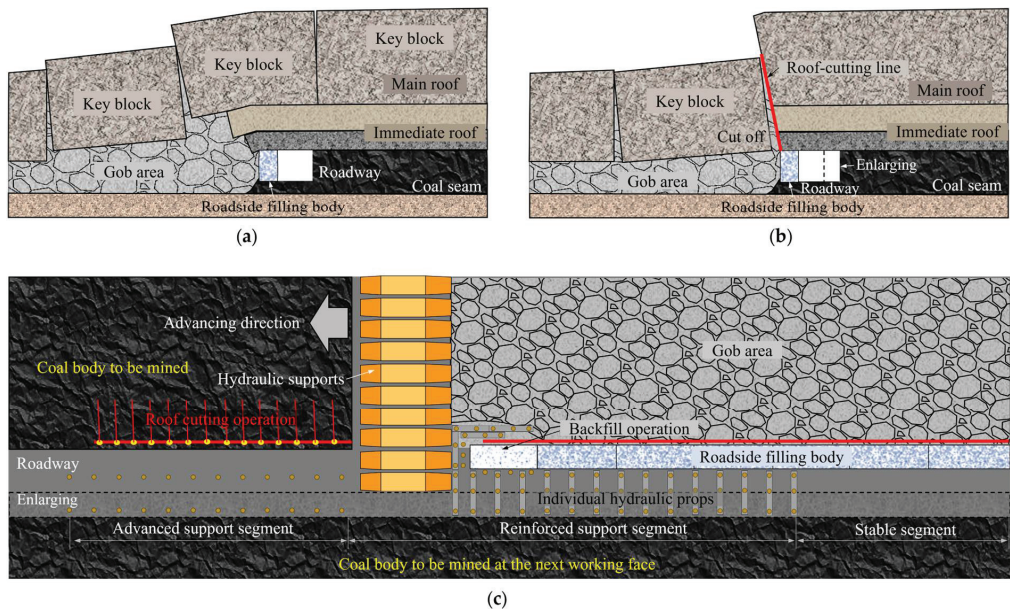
Delayed pre-splitting and cutting roof for gob-side entry retaining. (a) Gob-side entry retaining with backfill (b) Cutting roof on goaf side (c) Working methods of roof-cutting and gob-side entry retaining with backfill.
